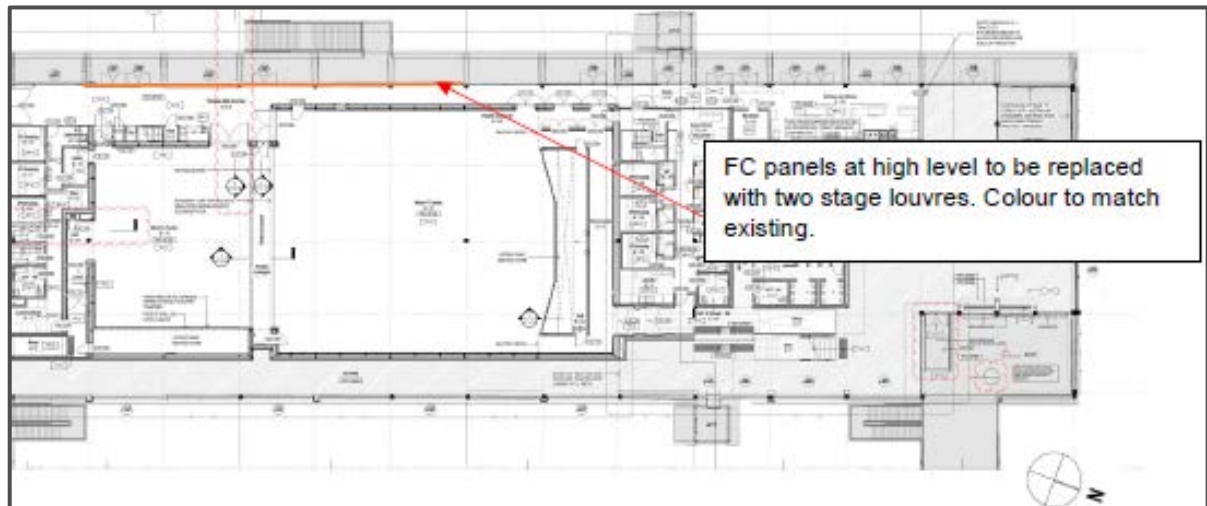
| Sydney Theatre Company's tenancy floor plan with location of proposed high-level louvres in orange (source: HIS)
